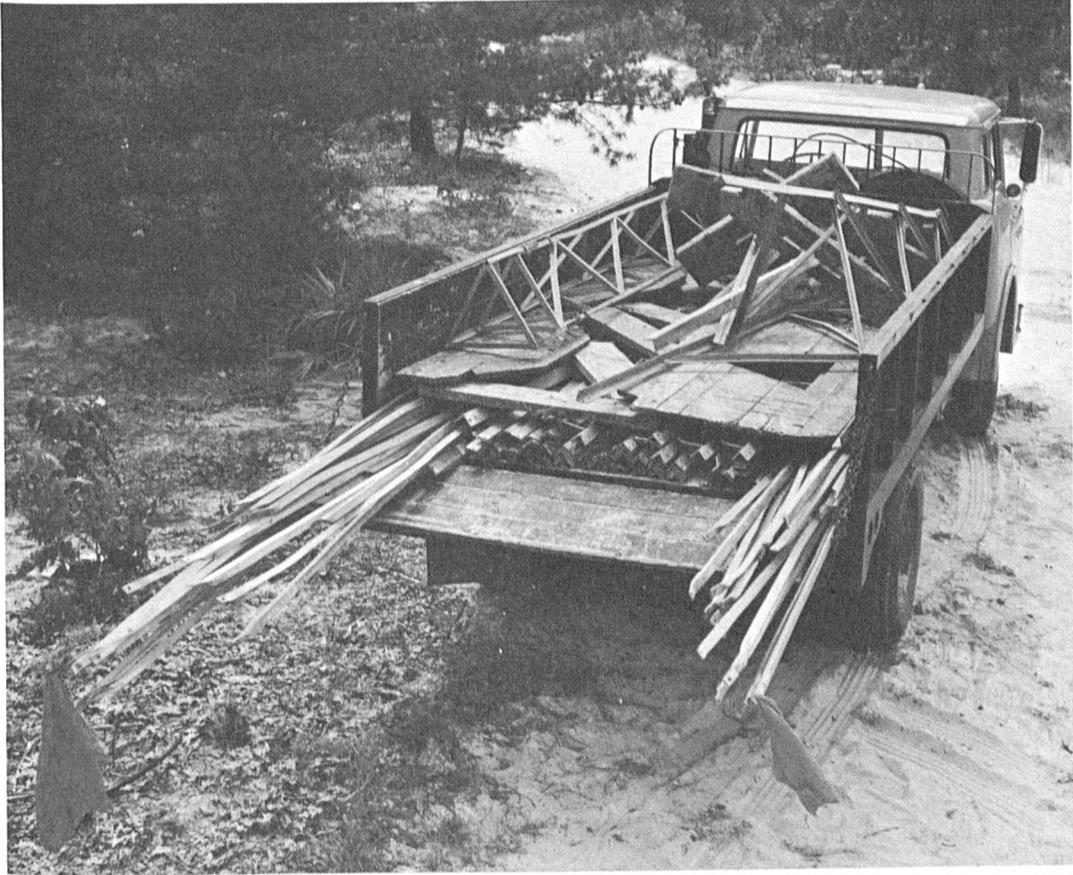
Steel truck carrying one 90-ft. tower.
